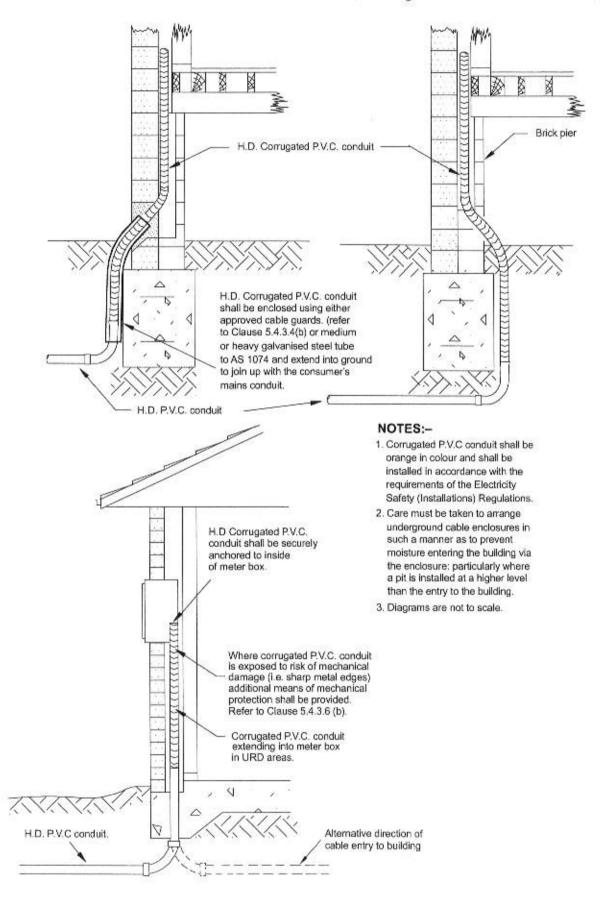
Alternative Cable Entries to Building Using Corrugated Conduit
